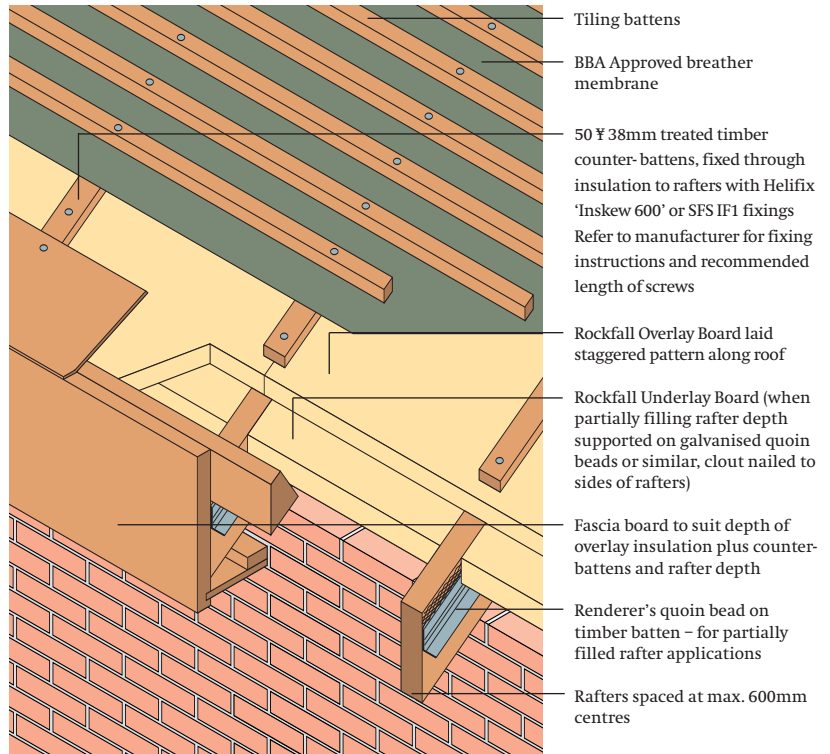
Rockfall Underlay partially filling timber rafter or trussed rafter construction.
